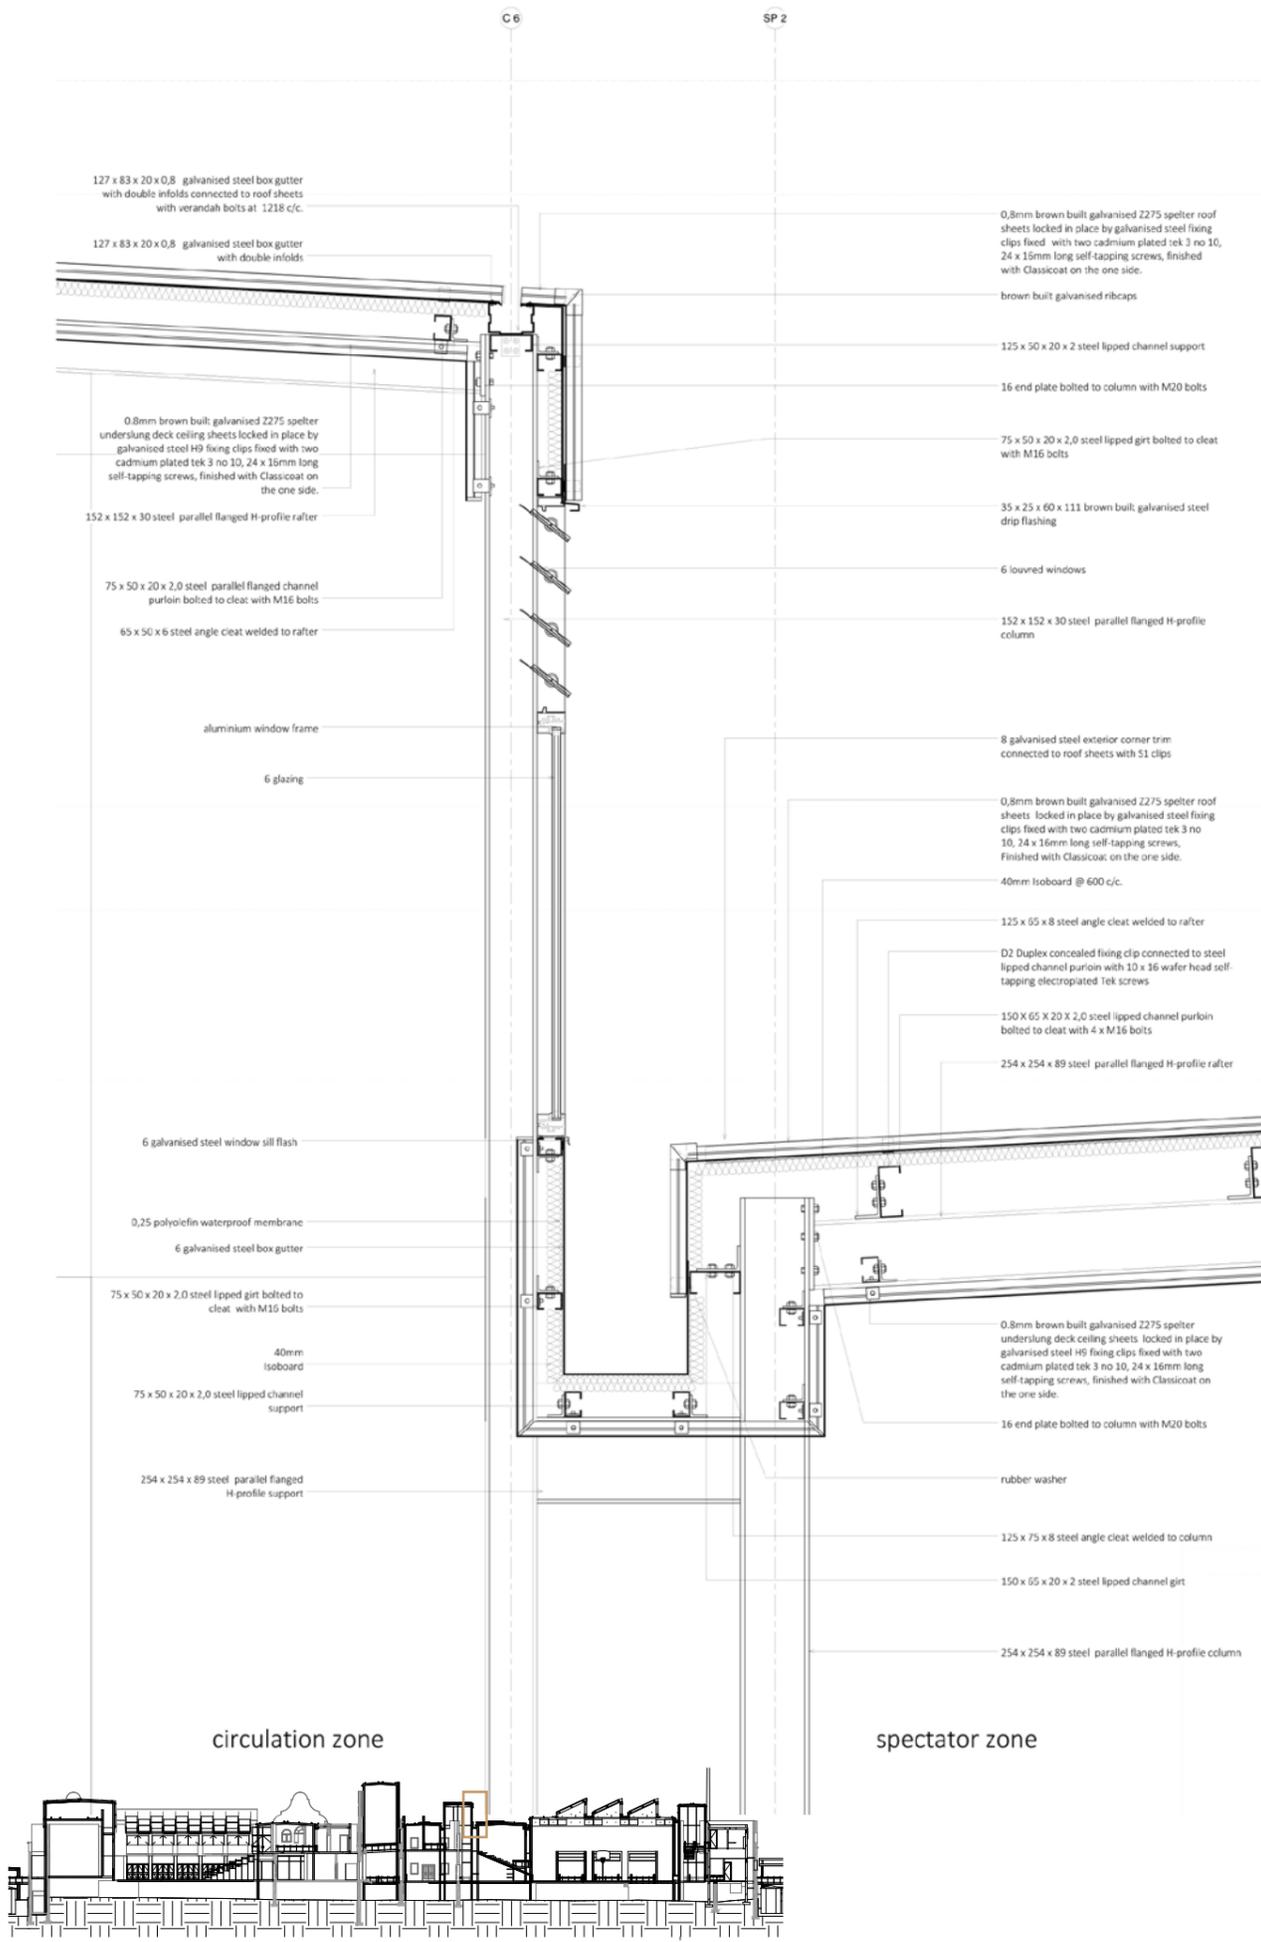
Presentation page 30: detail 2: roof- and skylight detail (Author November 2013)
